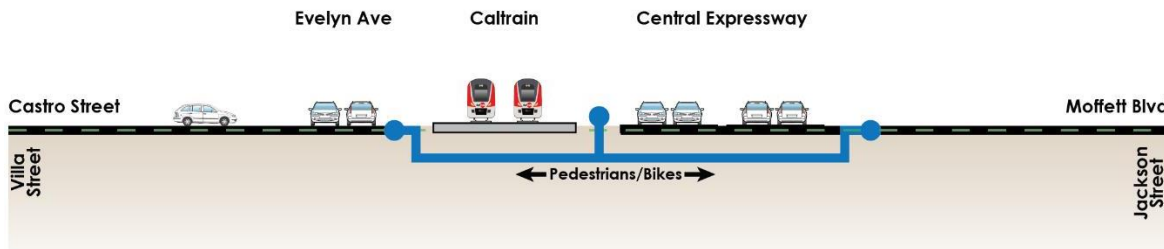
Alternative 4: Reroute Castro Street at Evelyn Avenue
